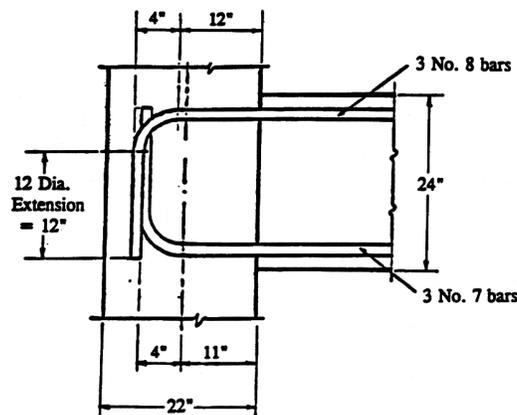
Detail of anchorage of flexural reinforcement in exterior column
